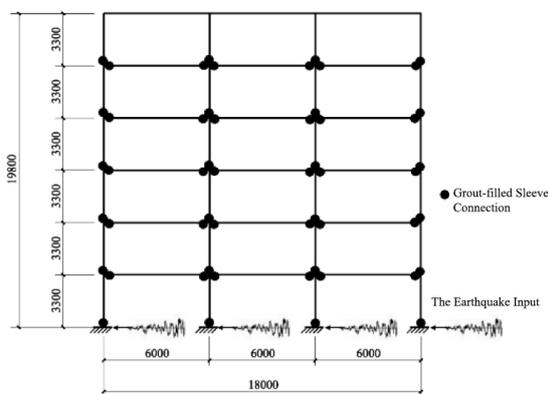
(a) the precast concrete structure KJ-1 with bottom-connected columns
